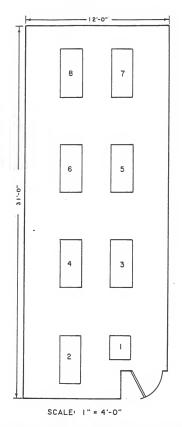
Lighting laboratory louvered ceiling fixtures
